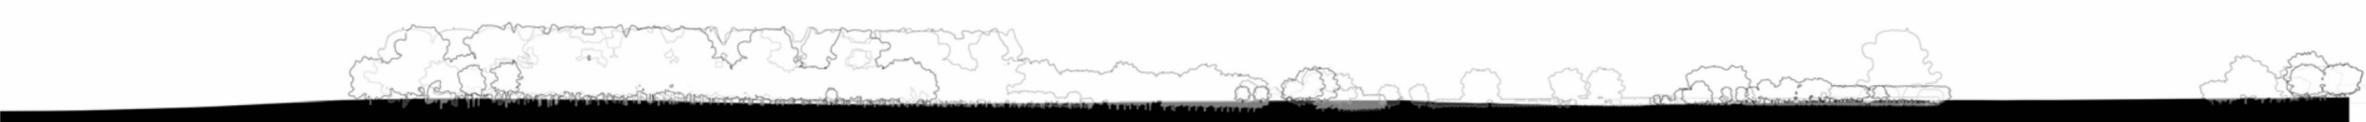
Existing Site Wide Section - North South iii-iii NTS
